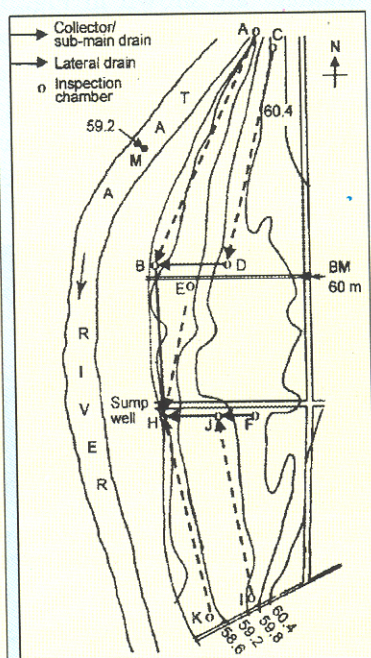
Near-parallel subsurface drainage layout in a 17 ha tea garden in Assam
